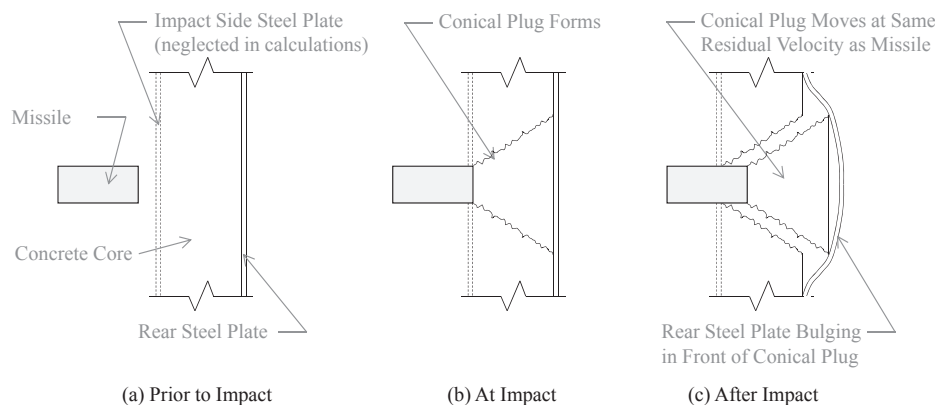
Impact sequence of missile on steel plate reinforced concrete wall.
